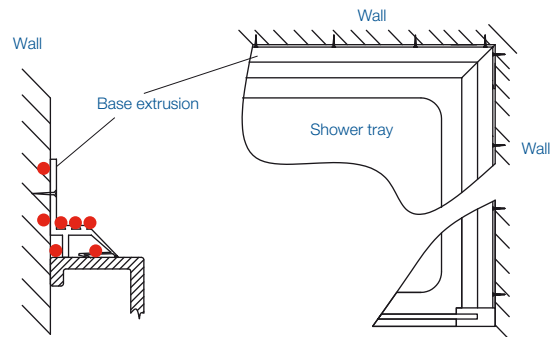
Forming shower tray base joint using base extrusion (Plan not to scale to help clarity)
